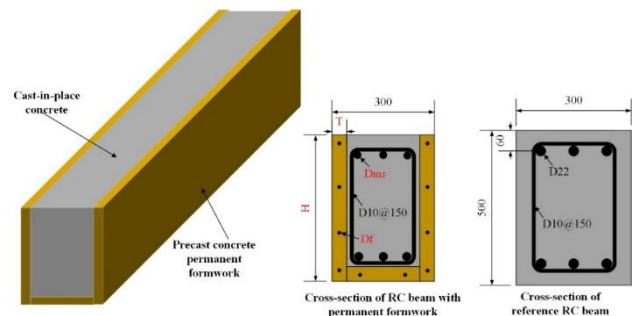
Reinforced concrete beam using permanent formworks and the reference beam
